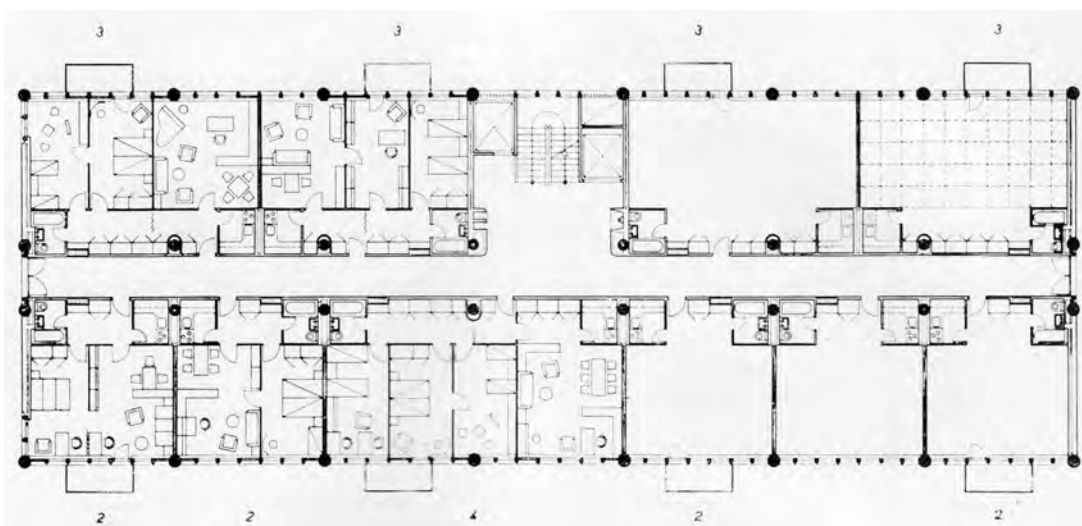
PLAN OF COLLECTIVE HOUSE, ZLÍN.
